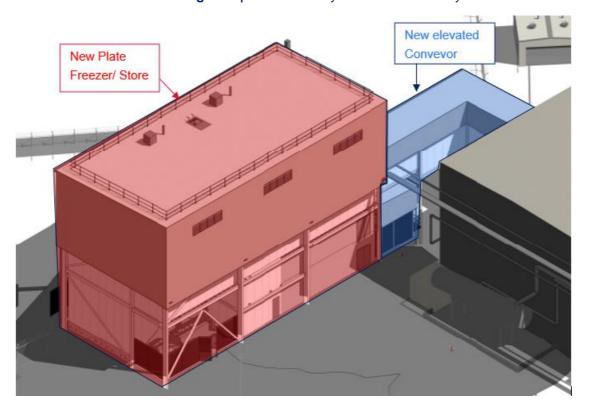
| Plate Freezer / Storage Room & Elevated Conveyor
